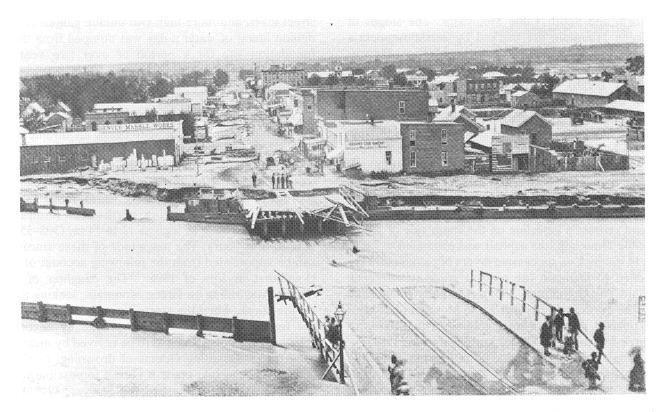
Photograph of Larimer Street bridge in downtown Denver, looking southwest, following flood of 1878. (Photo courtesy of Colorado State Historical Society.)
